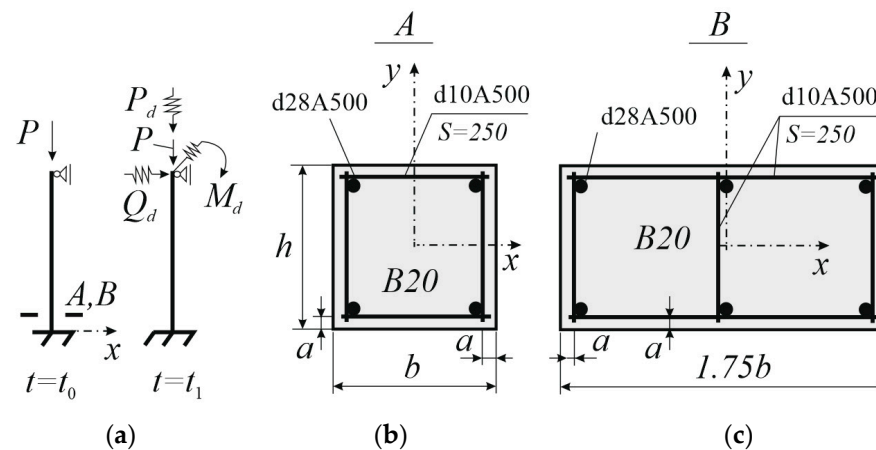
Structural model of the column (a), the reinforcement, and types of sections (b,c).
